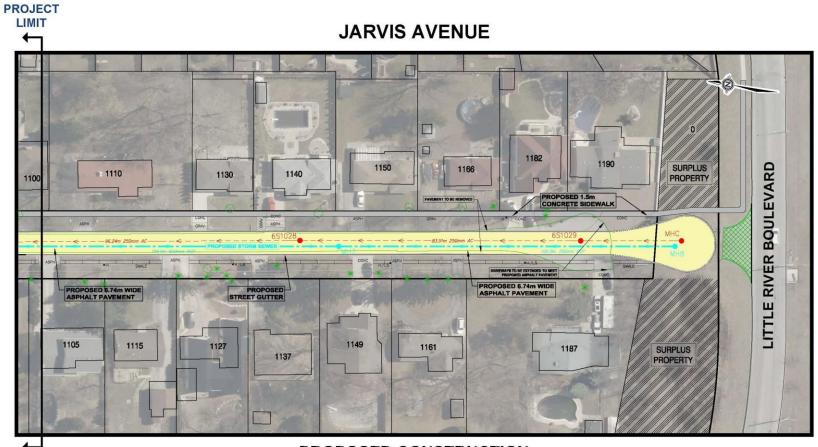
Recommended Design (Plan View) - Jarvis Ave from South of Dillon Drive to Beverly Glen Street
